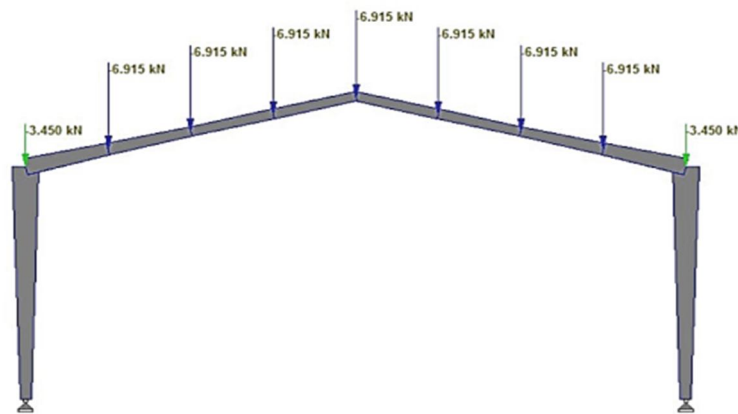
Live loads acting at the purlin positions of pre-engineered steel frame
